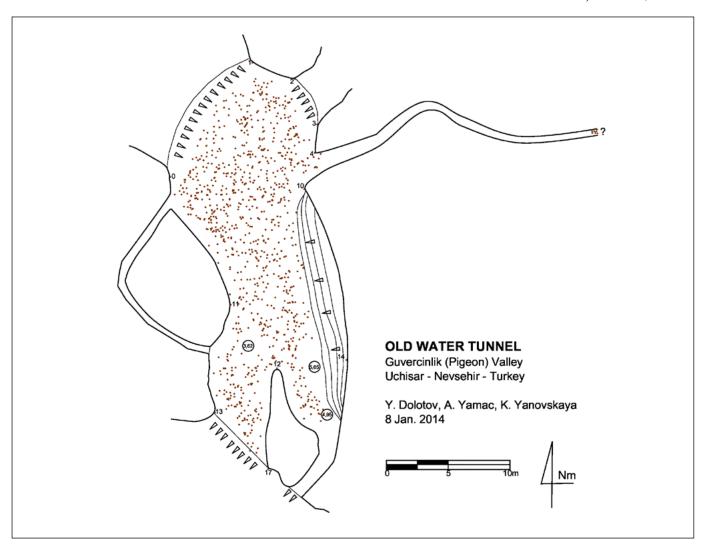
plan of old water tunnel (drawing A. Yamaç).
